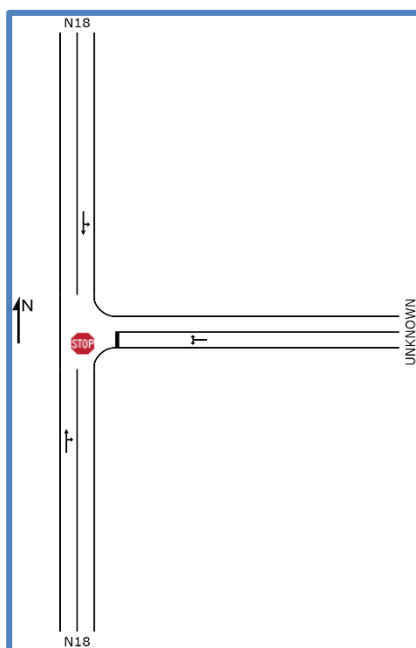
Existing Layout of N18 and Nelson Mandela Street Intersection
